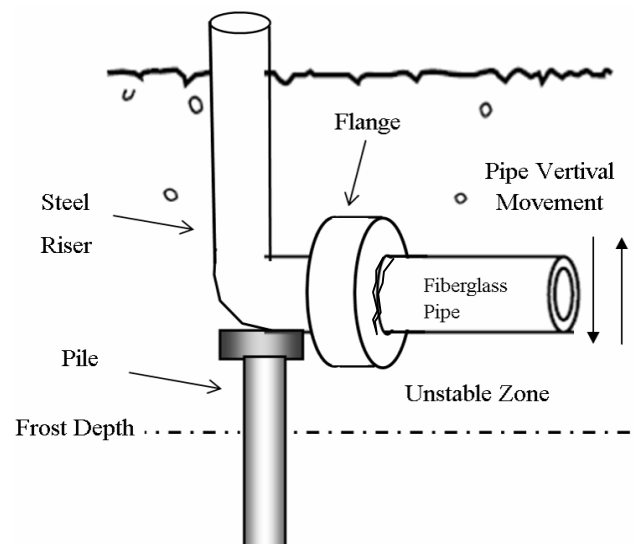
Typical Fiberglass Pipe Failure Close to a Riser
